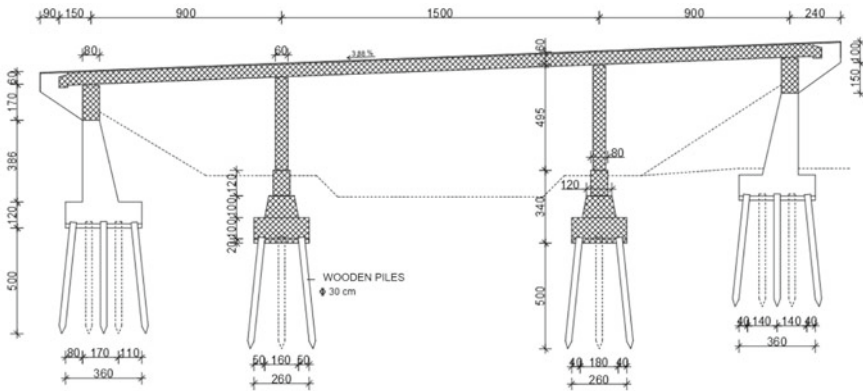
Longitudinal section of the 3-span bridge selected as the second case study
